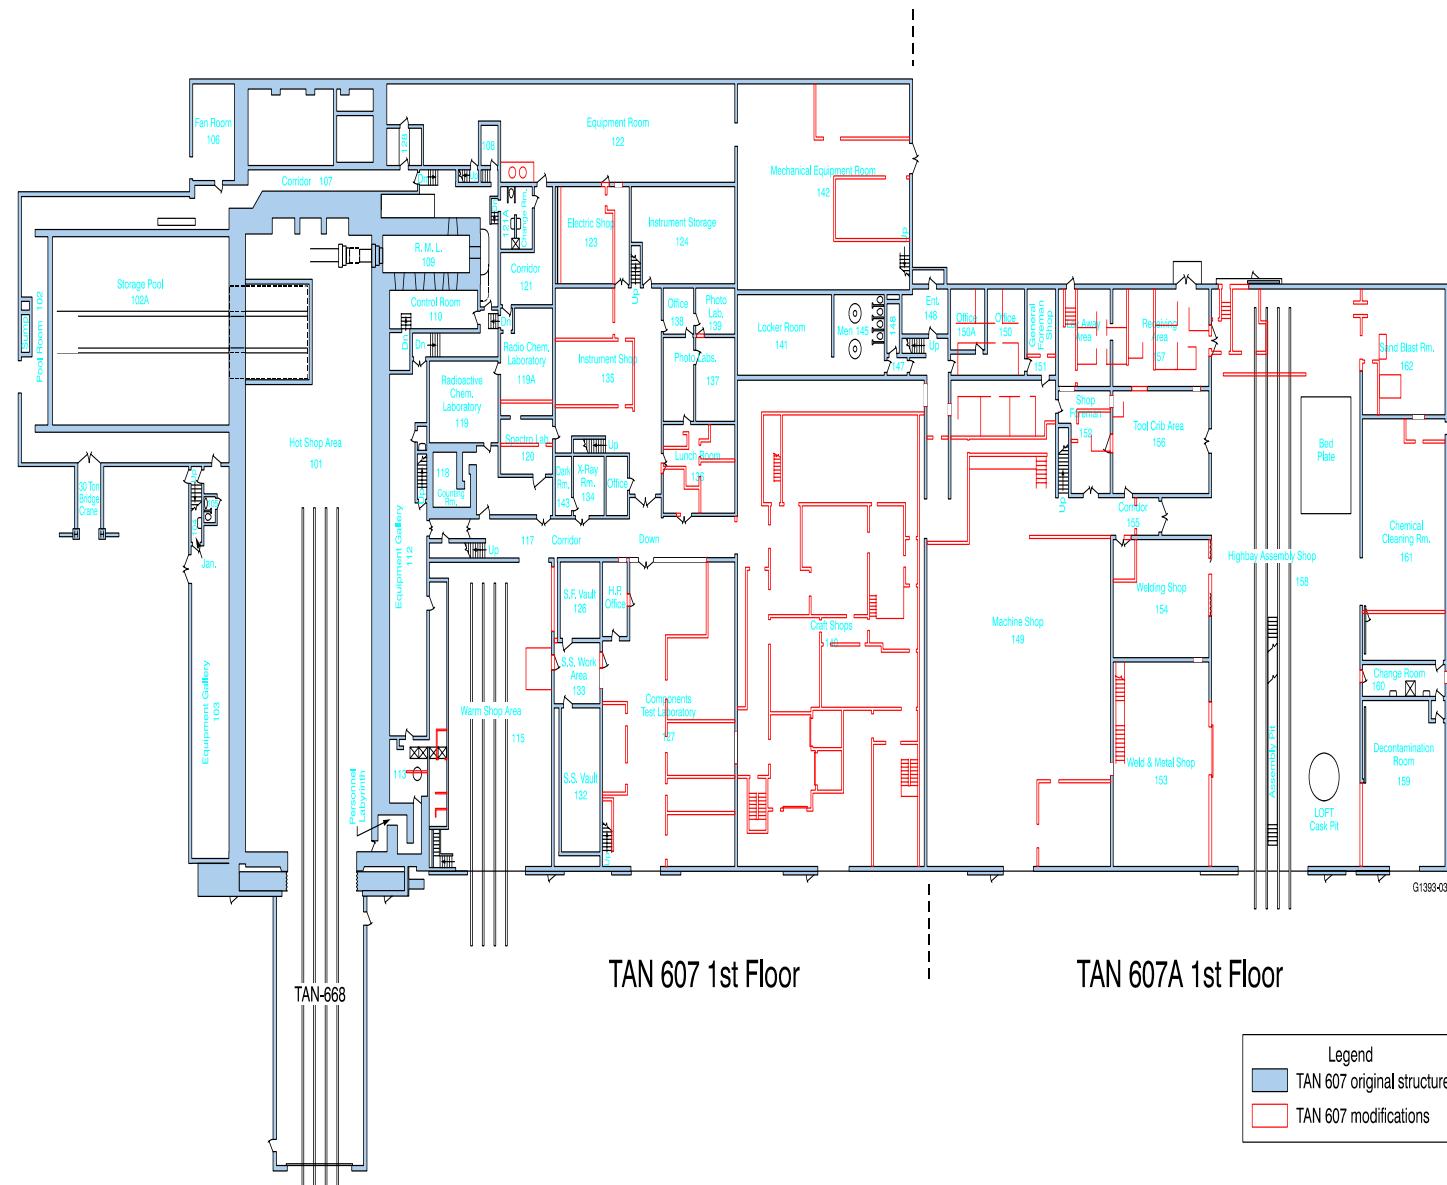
TAN-607 and TAN-607A floor plan, first floor (from Appendix A, EDF-7173).
